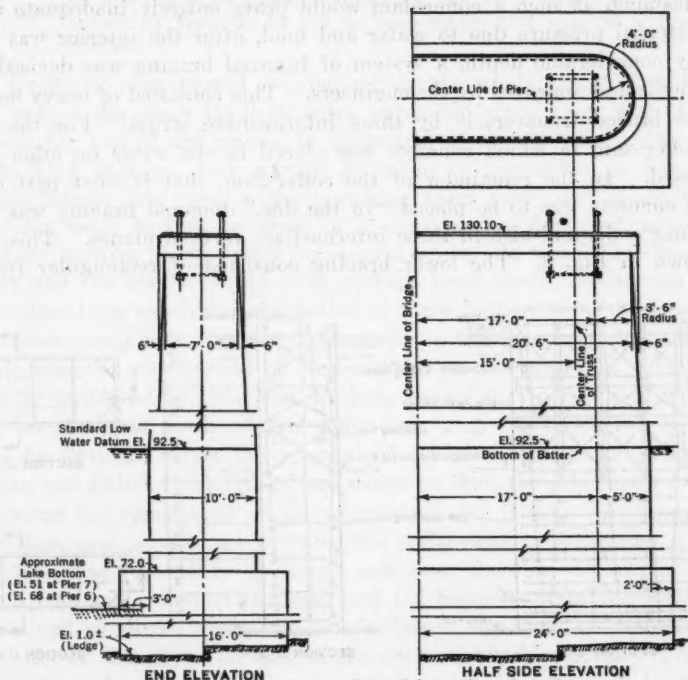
DIMENSIONS OF CHANNEL PIERS.
